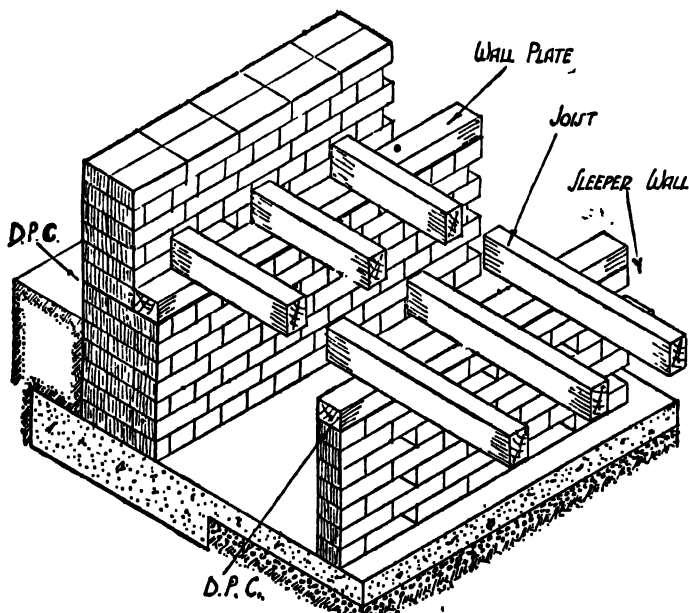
GROUND FLOOR CONSTRUCTION - SLEEPER WALLS
